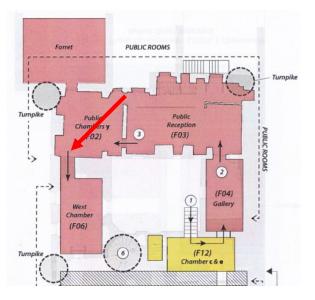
PLan of Riddle's Court - Circulation Plan - Doorway unblocked
